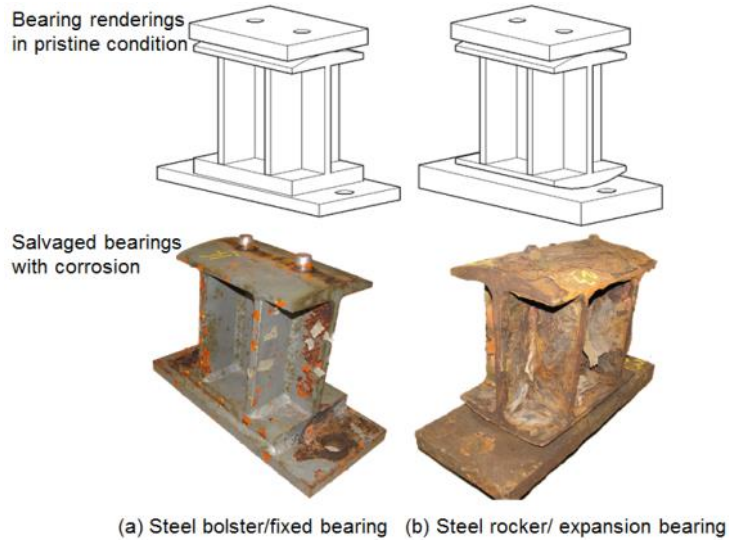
Schematic and picture showing corroded (a) bolster and (b) rocker bearings
